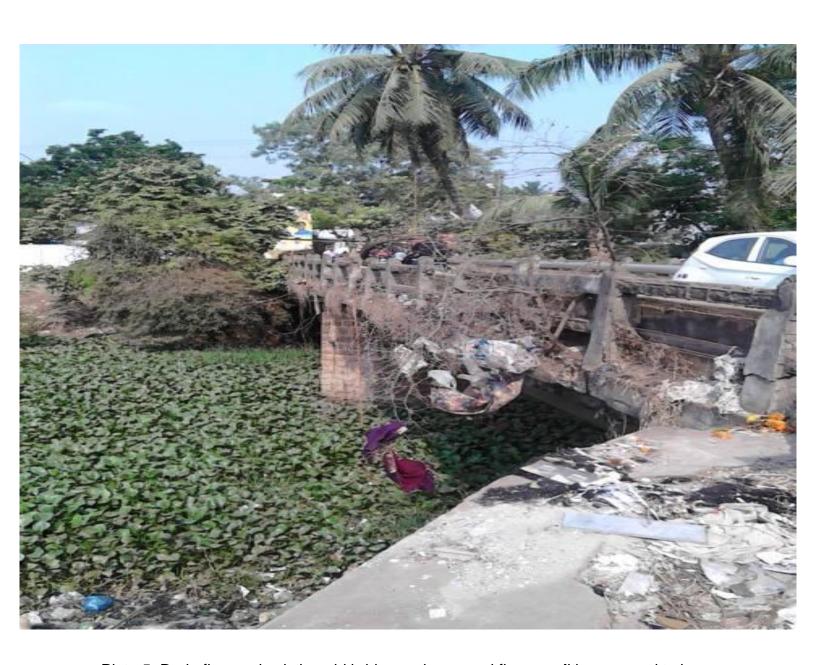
Drain flow and existing old bridge under normal flow conditions – need to have vacuum dewatering system for foundation concrete laying
